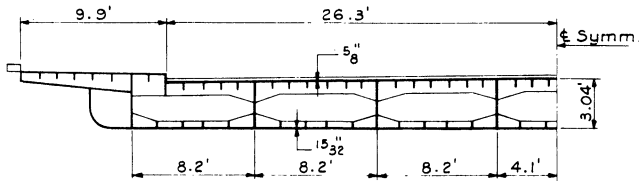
Nishi-Ohashi Highway Bridge over Nagahori river, Japan. Span 103 ft. A multi-cell steel bridge with a 2.2 in. asphalt wearing surface
